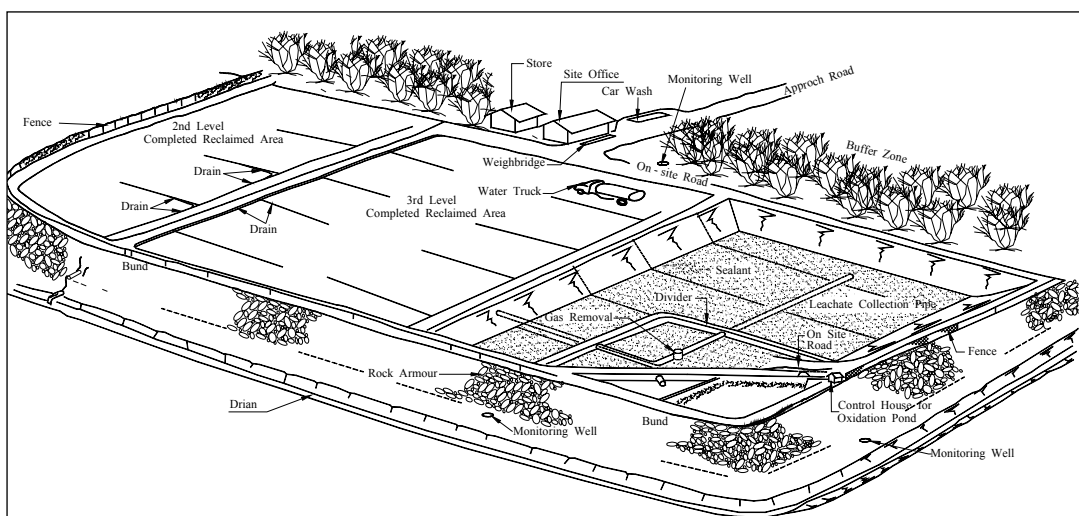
(c) Typical Layout for the Level 4 Sanitary Landfill
